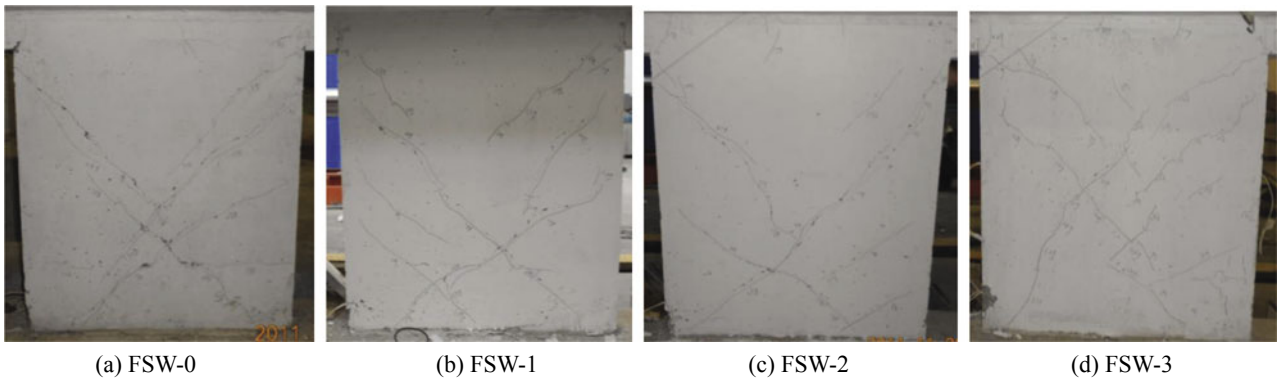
Failure mode of the first story shear wall with 1/100 first story drift angle
